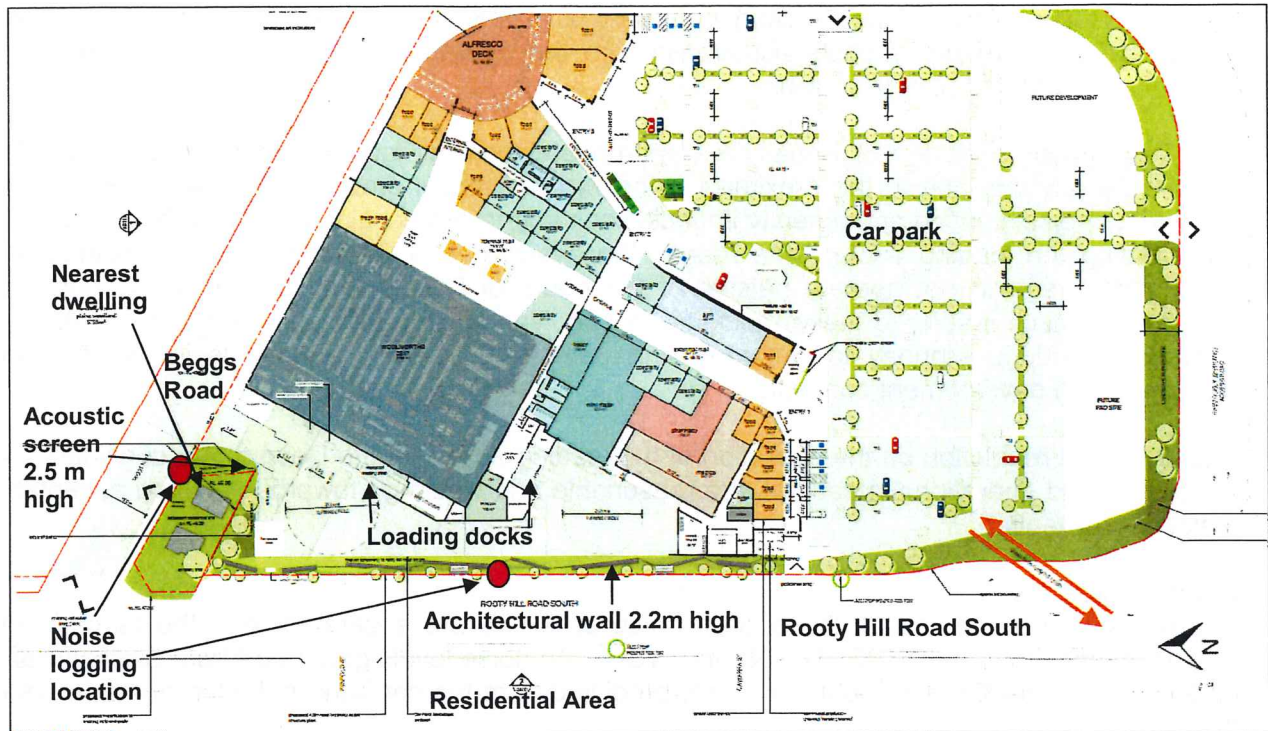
Site plan showing existing dwellings in relation to loading docks (source: Applicant's RtS)
